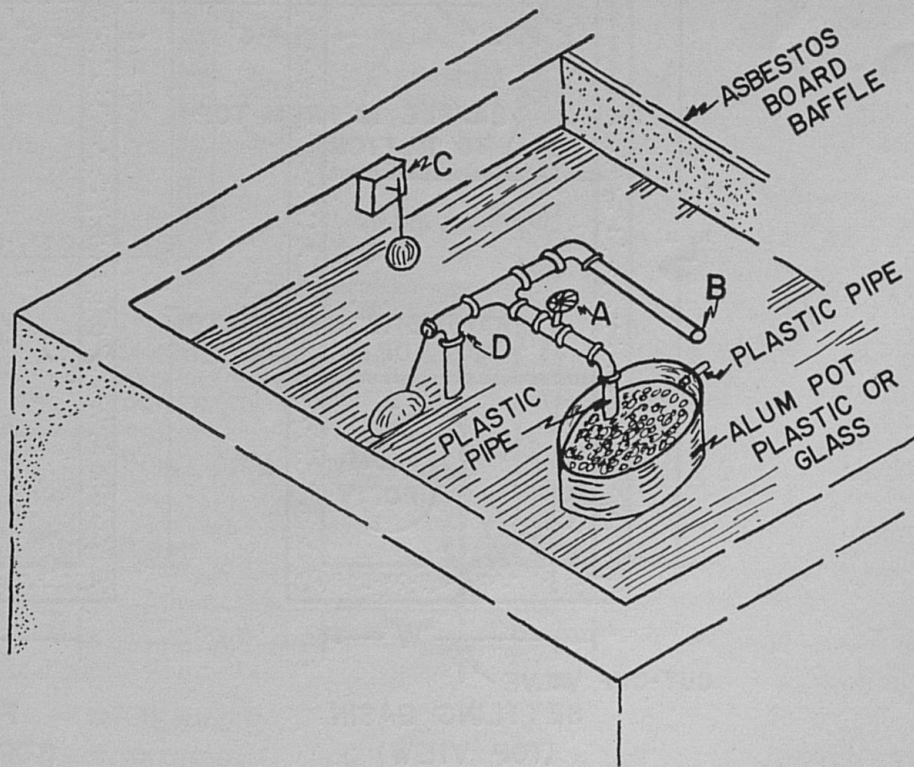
Settling basin. Note: Use float switch "C" if pump is used at pond as in Fig. 1. Use float valve "D" if system is placed below pond as in Fig 2.
